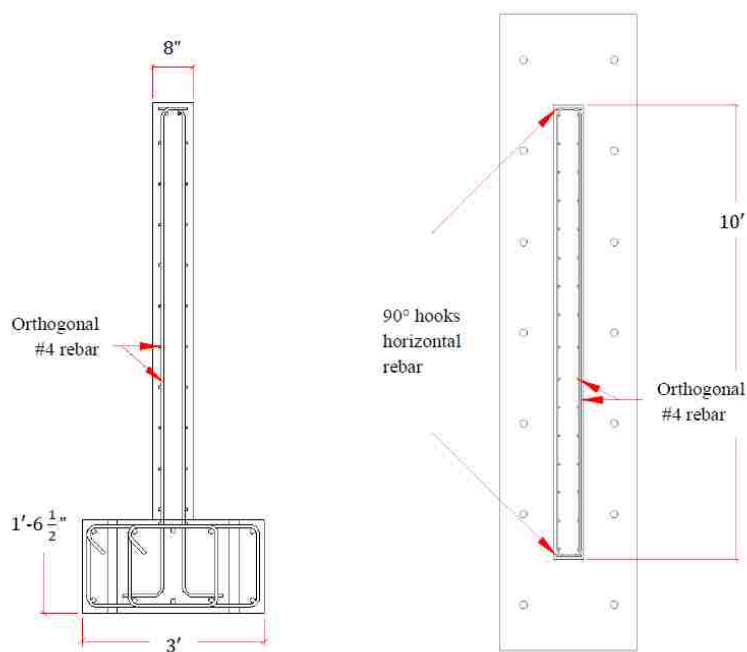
Whittaker Specimen Details (Rocks, 2011)
